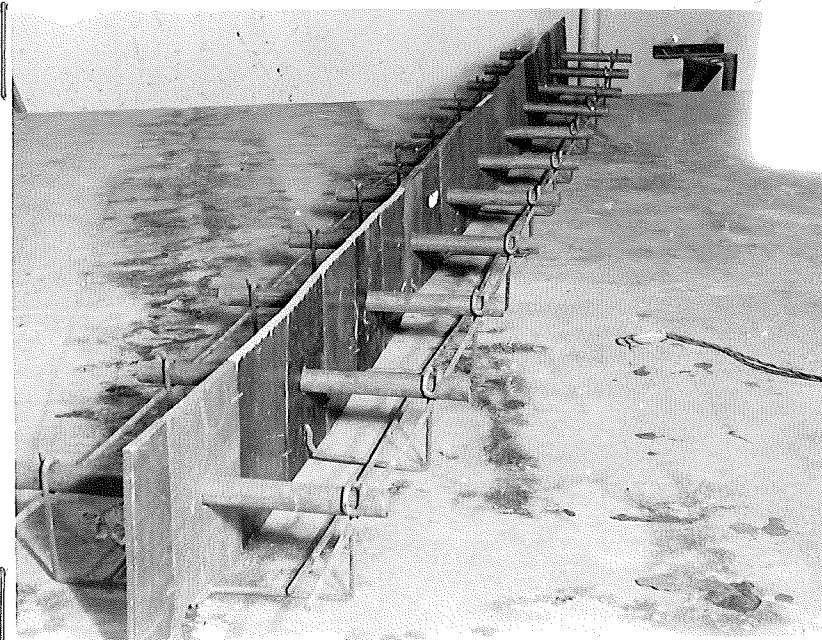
Contraction joint made of  $3/8$  inch commercially compressed redwood, constructed in Laboratory, surface treated, and installed in Grand Ledge-Mulliken pavement.
